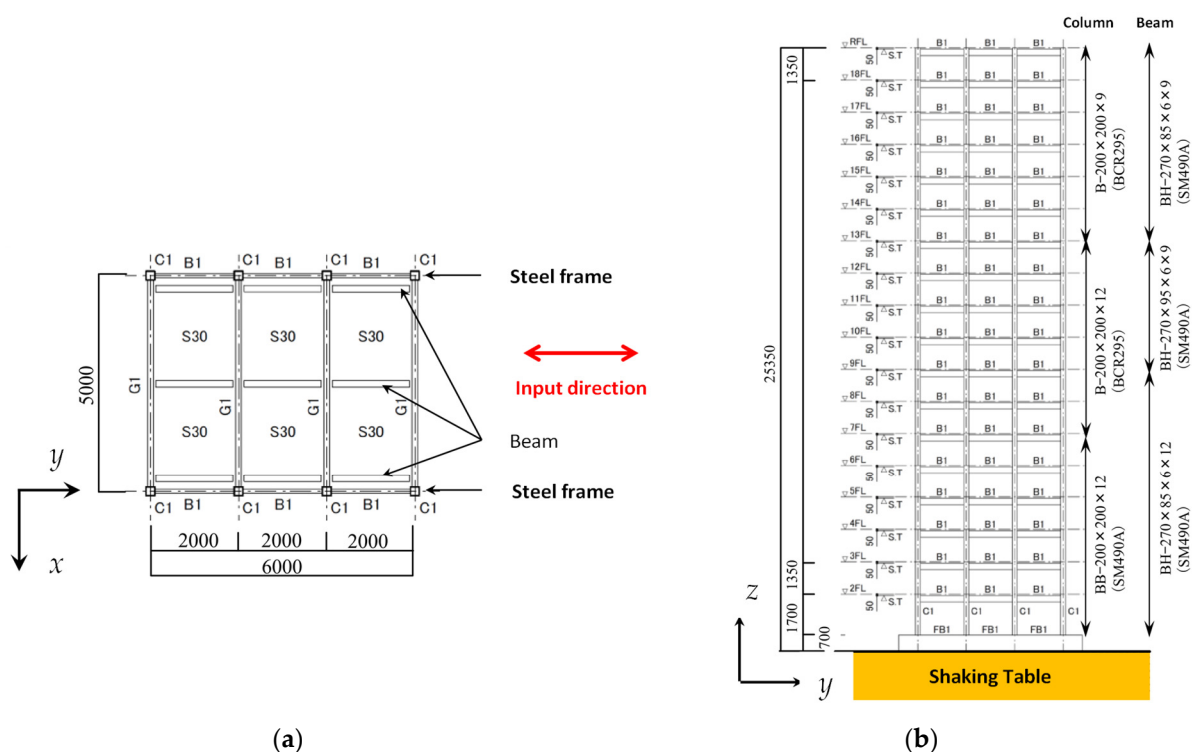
Framing plan and elevation of a 1/3-scale steel building: (a) Framing plan; (b) framing elevation plan.
